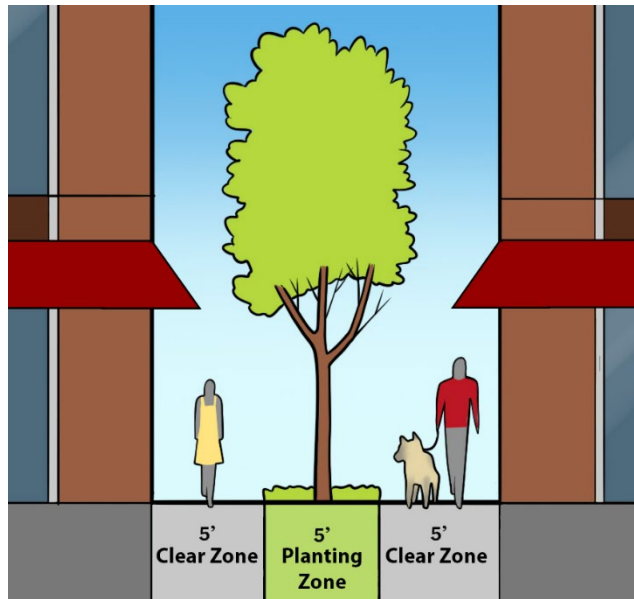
Internal Circulation Route Option 2 Cross Section
